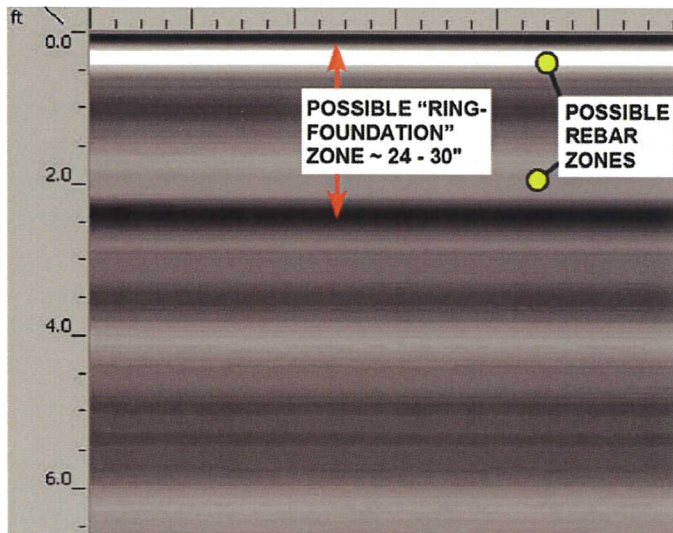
GPR scan section of Tank 22, Sta # 0+63. Possible boundary for ring foundation seen at approximate 24 – 30 inch.
